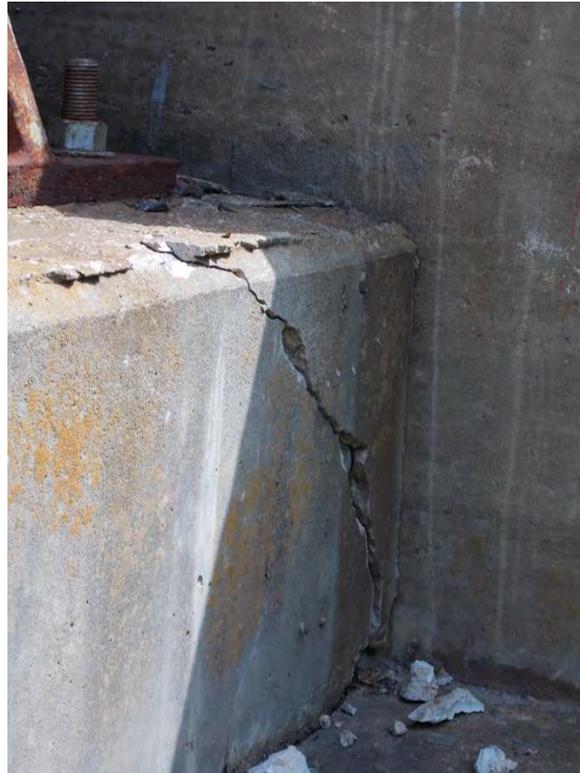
Full-Height Vertical Fracture in South Face of Bearing Pedestal; East Abutment
